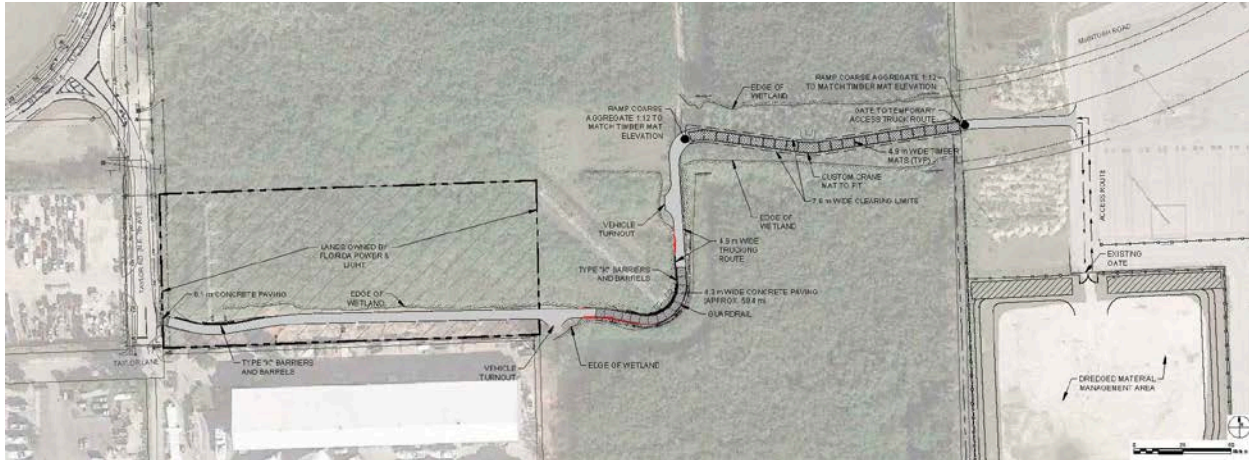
One-Way Truck Haul Road for Dewatered Dredged Material
